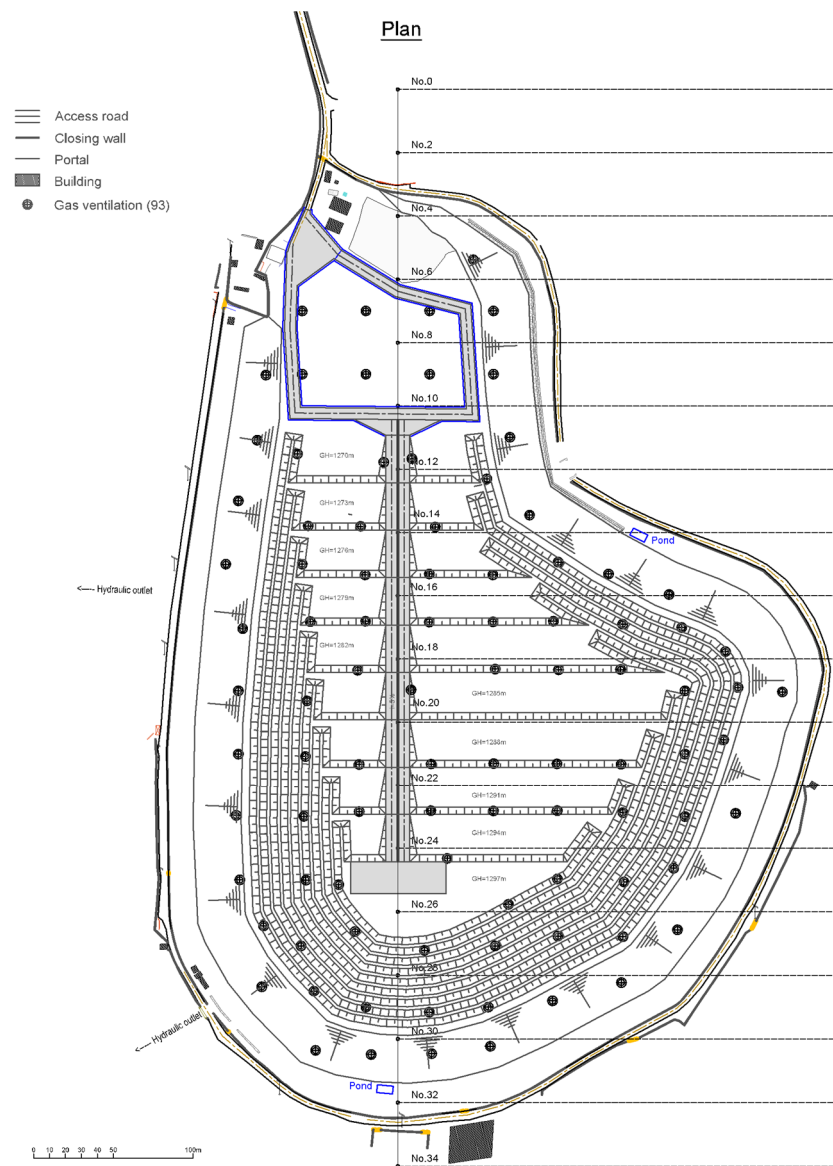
Operation Plan of the Landfill Site (Final Stage)
